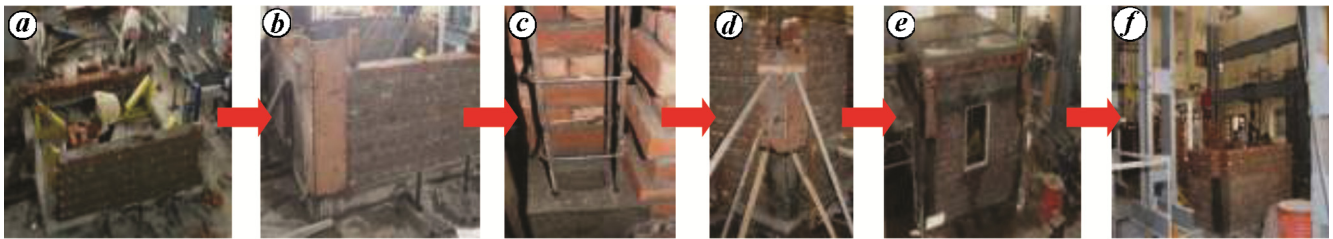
Sequence of construction of confined masonry (CM) building. *a*, Construction of masonry wall with provision of reinforcement in tie-column. *b*, Providing shuttering on two faces of tie-column. *c*, Casting of tie-column followed by subsequent masonry. *d*, Provision of keys in concrete and masonry for better bonding of concrete with masonry. *e*, Subsequent shuttering of tie-column; *f*, Completed CM model.
